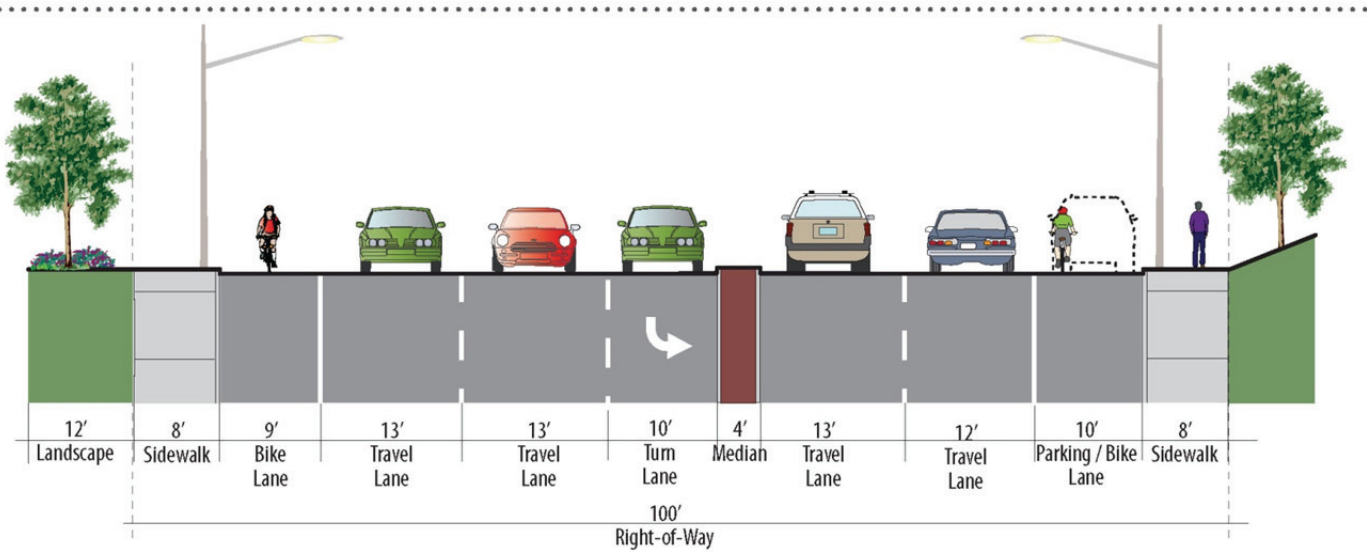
Proposed Bikeway Improvements, Section C – Kanan Road (North)
